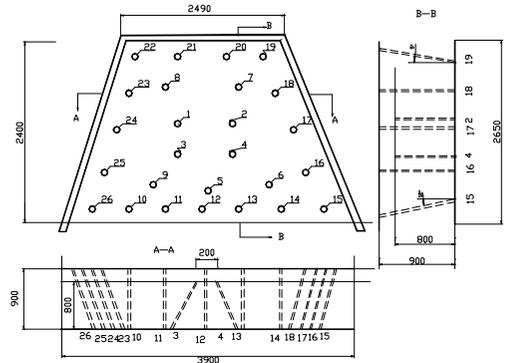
Blasthole layout diagram for -330 m mining area excavation face.
